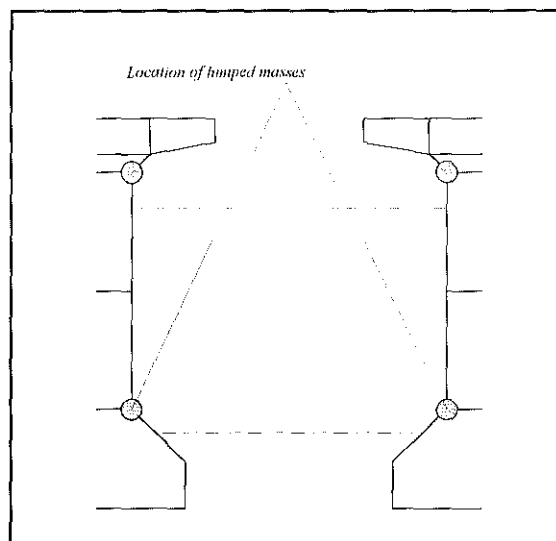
Lumped Mass Locations for Steel Diaphragms in Northbound Bridge Finite Element Model.
